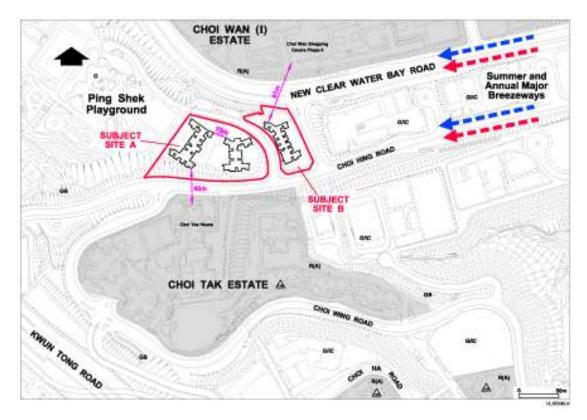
Distances of proposed blocks and for the surrounding existing buildings
